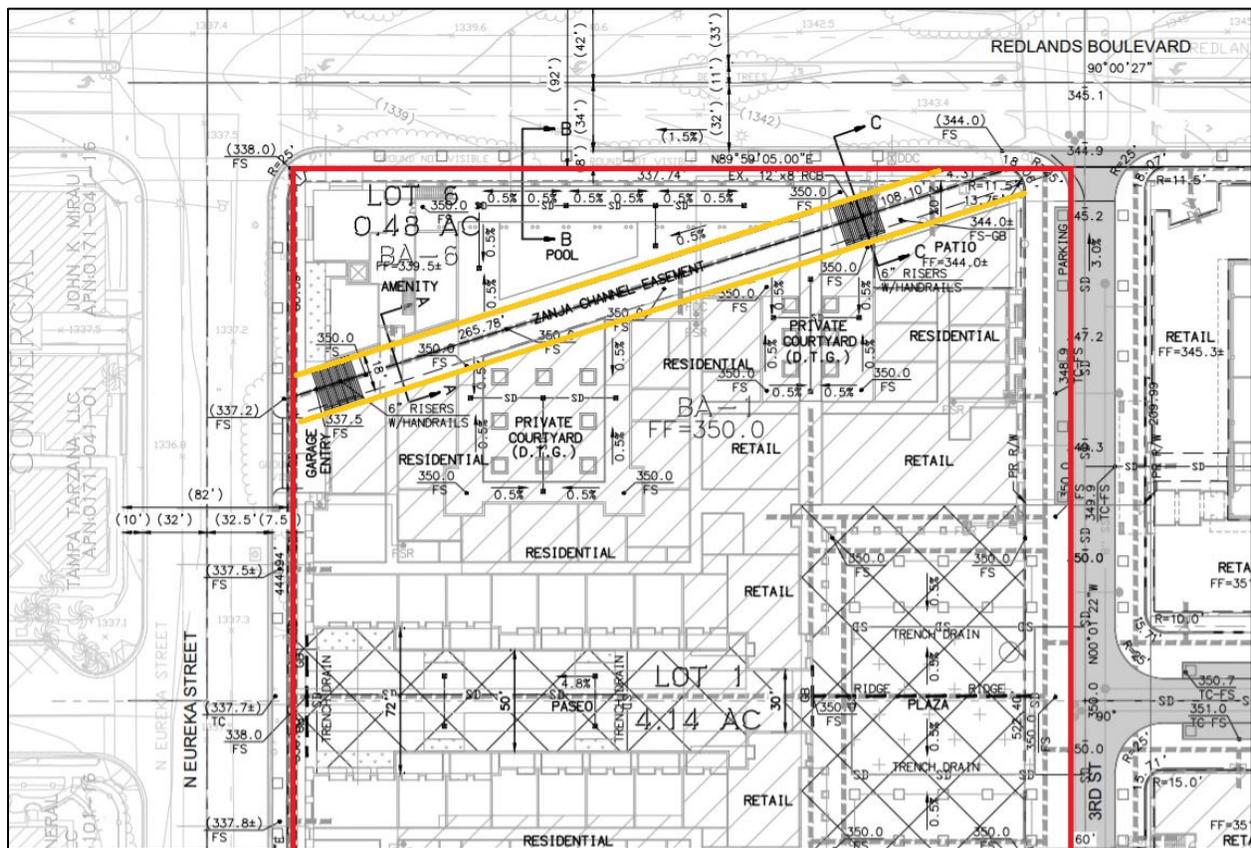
Conceptual Grading and Drainage Plan with Mill Creek Zanja Outlined in Orange and the Project Area in Red (Gilbert 2021)
